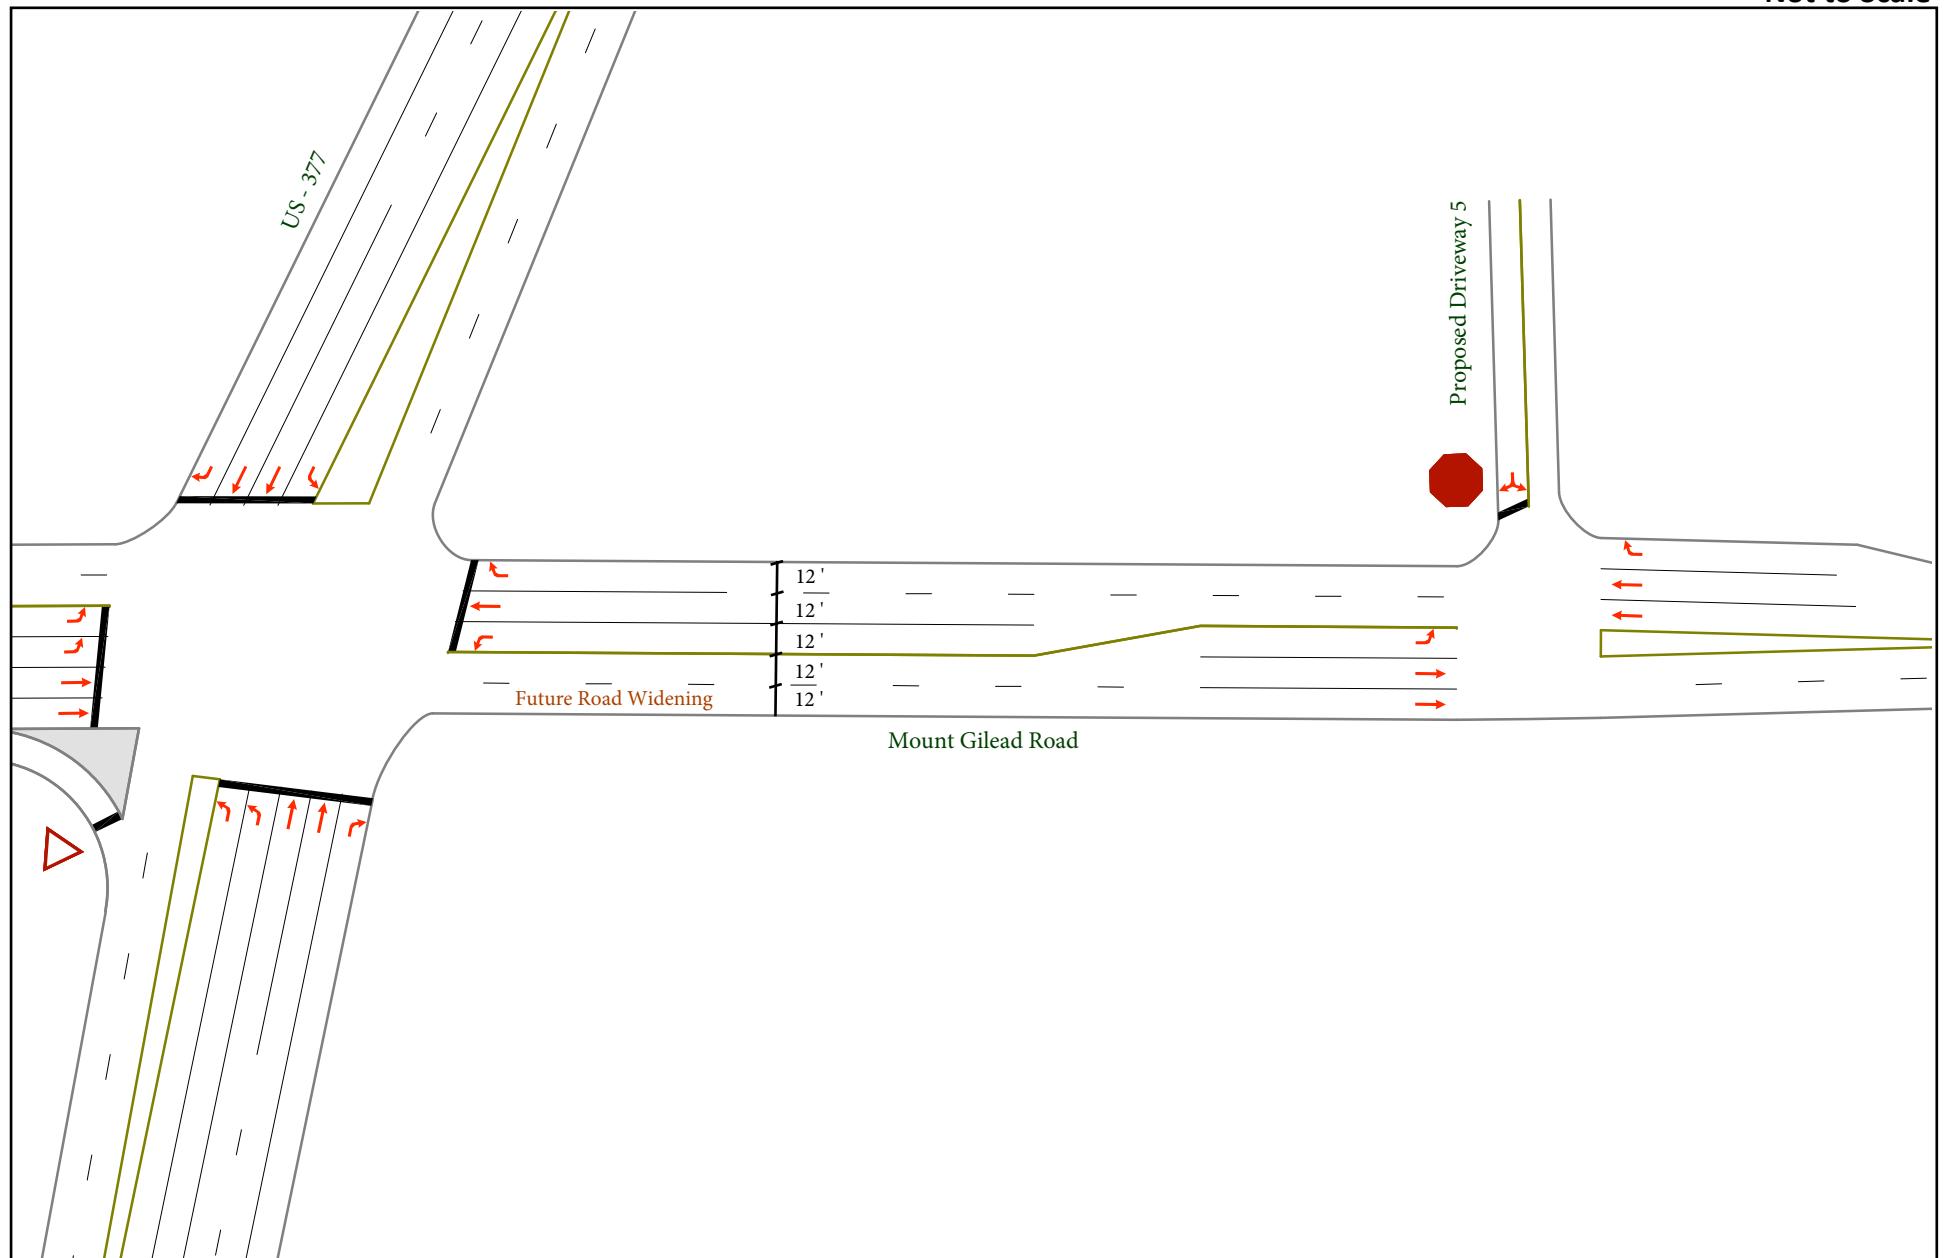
B. 2030 Proposed Roadway Geometry and Traffic Control
